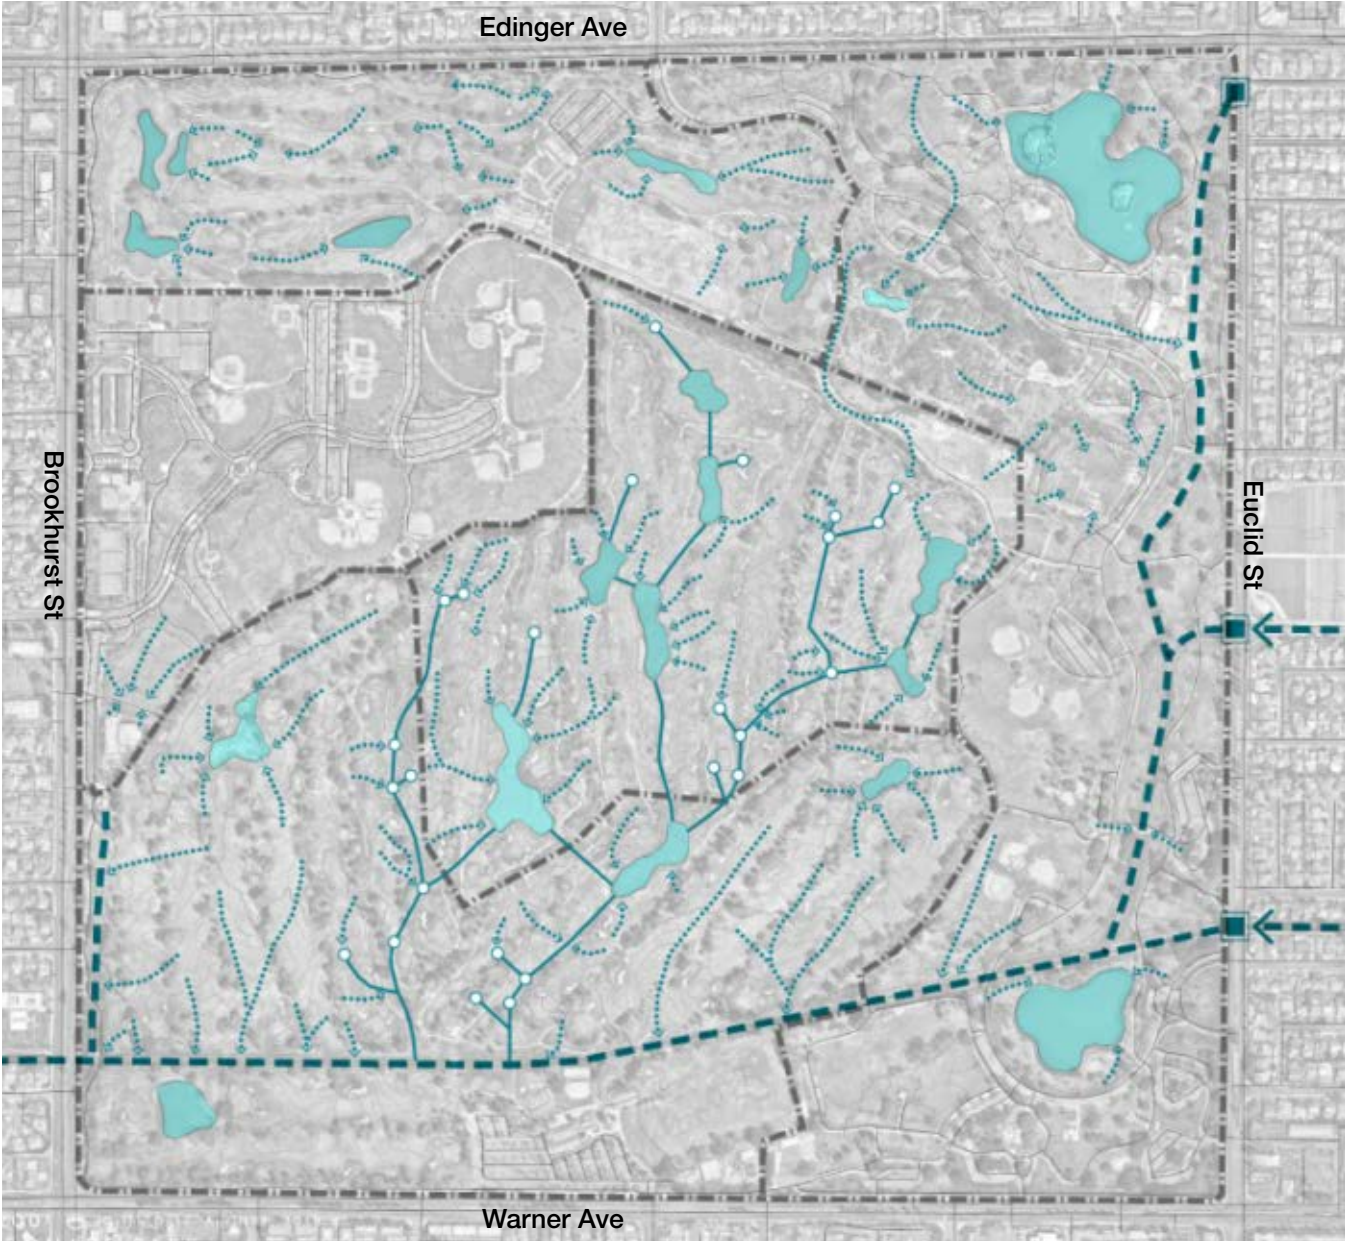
Existing Drainage Infrastructure Plan
